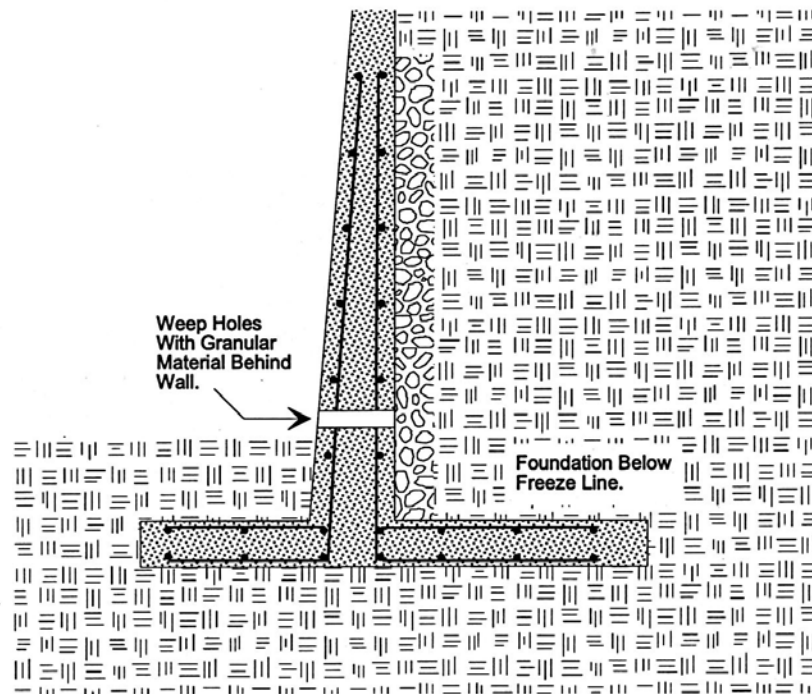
Cross Section of Typical Reinforced Concrete Retaining Wall
